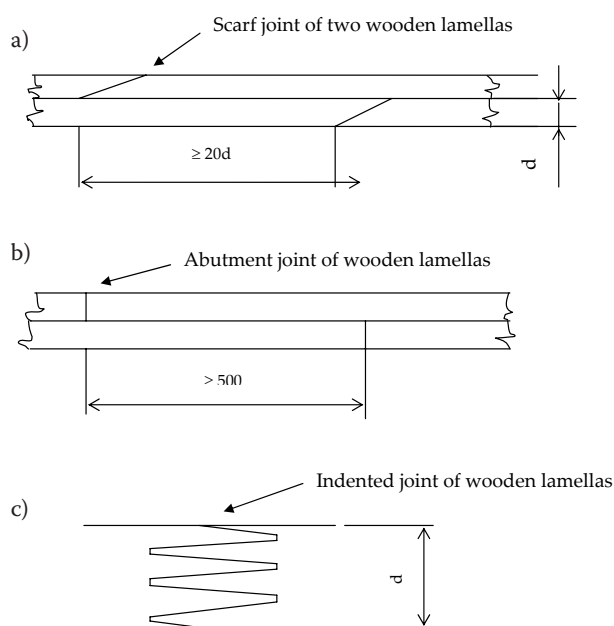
Bonded joints of lamellas: a) scarf joint, b) abutment joint, c) indented joint
